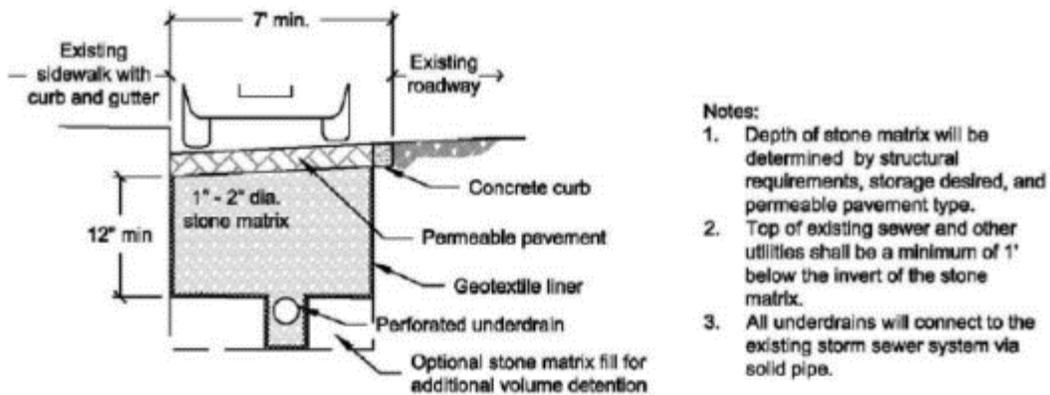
Example Permeable Pavement Design near Existing Roadway and Surface
